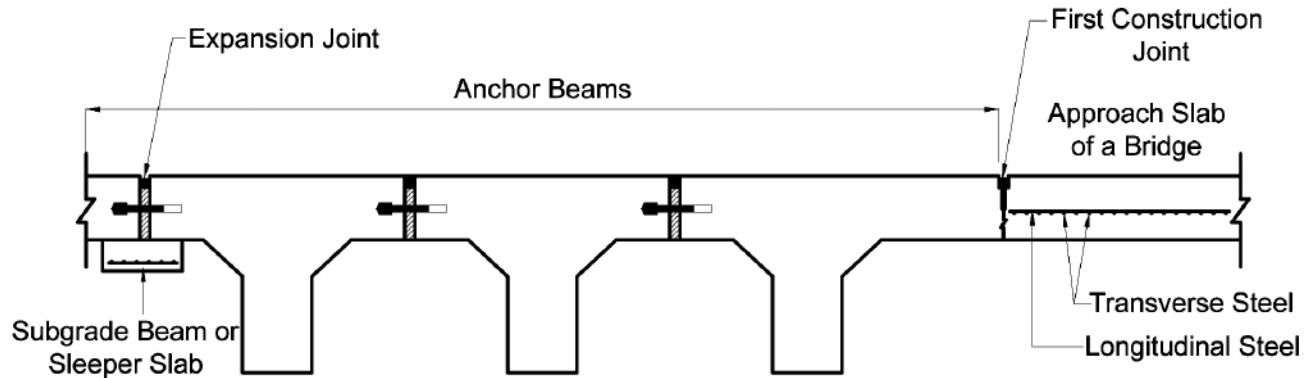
Series of Anchor Beams Provided before an Approach Slab of a Bridge
